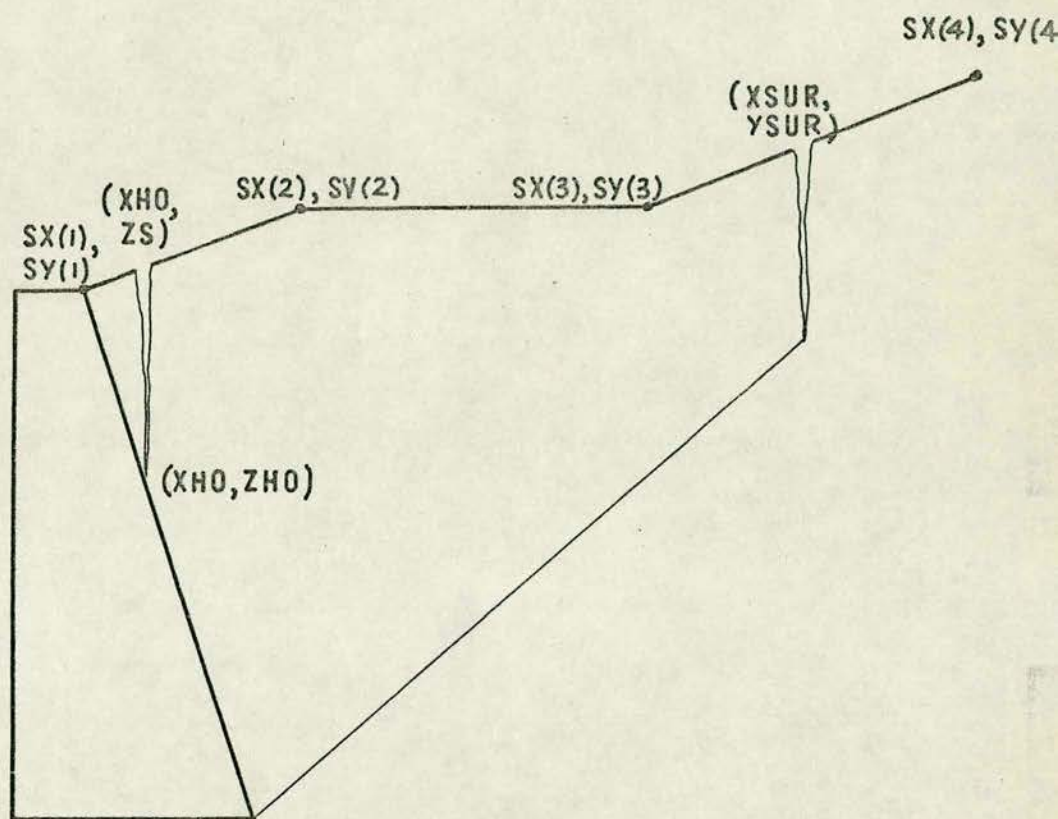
POSITION OF TENSION CRACK ON WALL BACK
